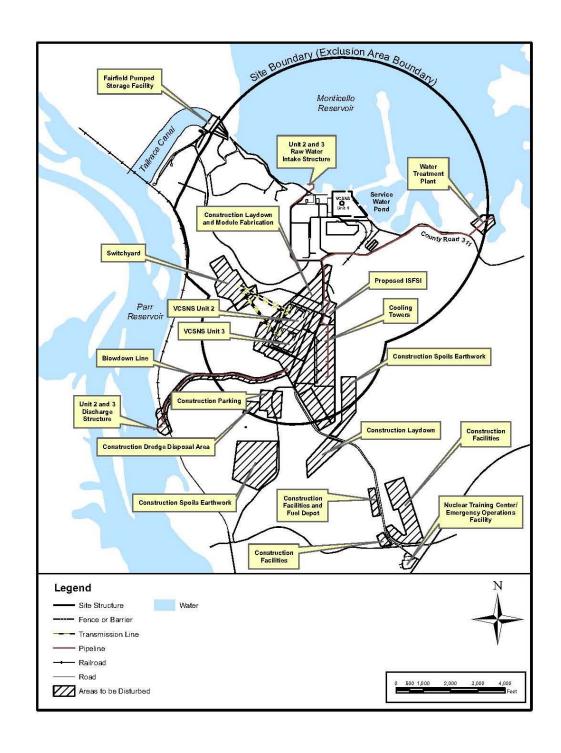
VCSNS Site and Proposed Plant Footprint
